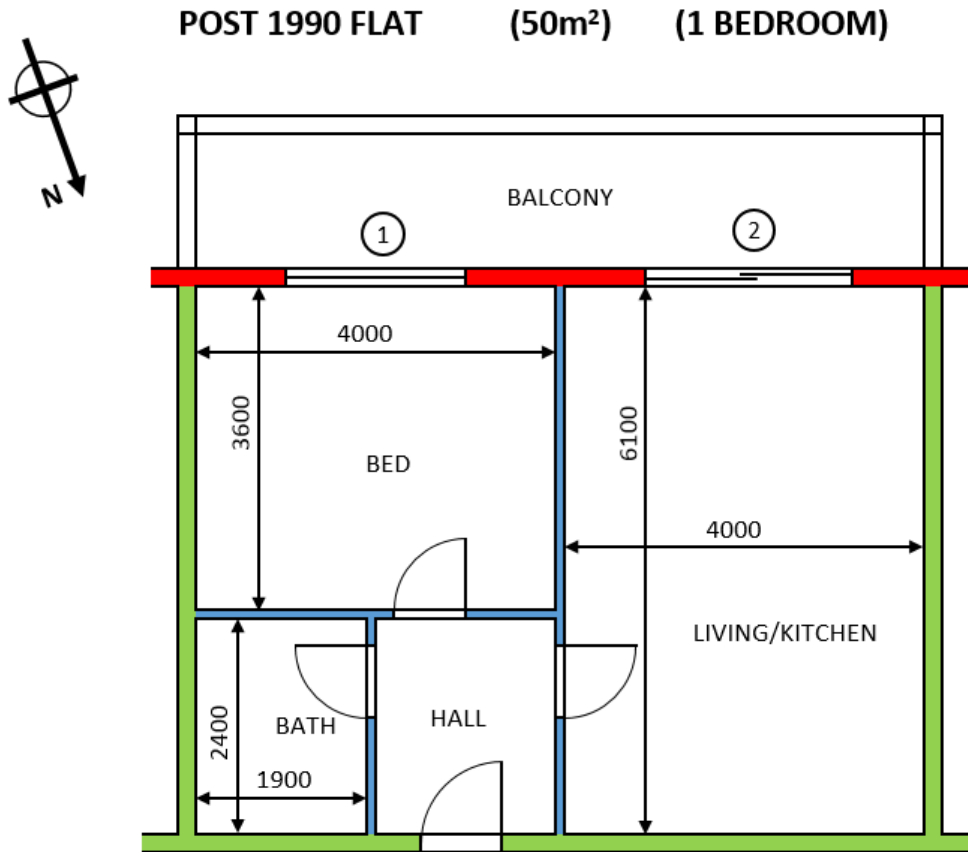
Post 1990 Flat – building layout. Window references are numbers in circles; red walls are external, blue walls are internal and green walls are party.
